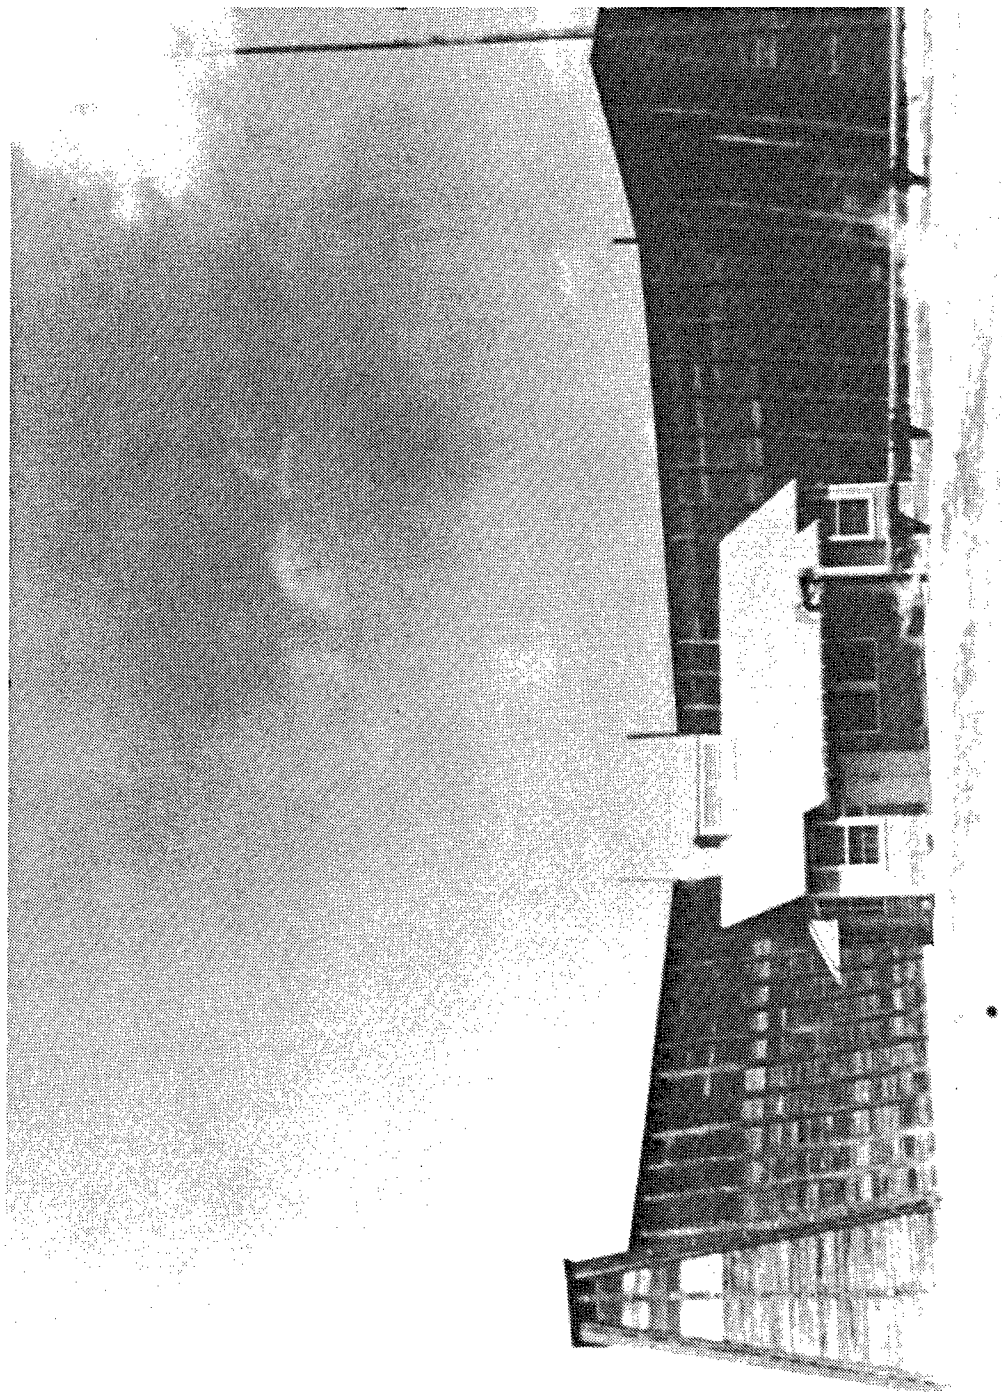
O Building, banked by barricades, Area B (courtesy of Holston AAP Photo Set No. 27-B [on file Engineering Vault, Building 26]).
